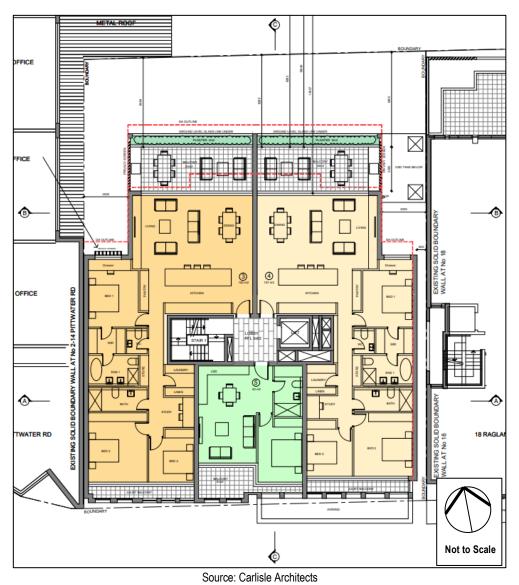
Approved Level 1 Floor Plan (To be Amended)
